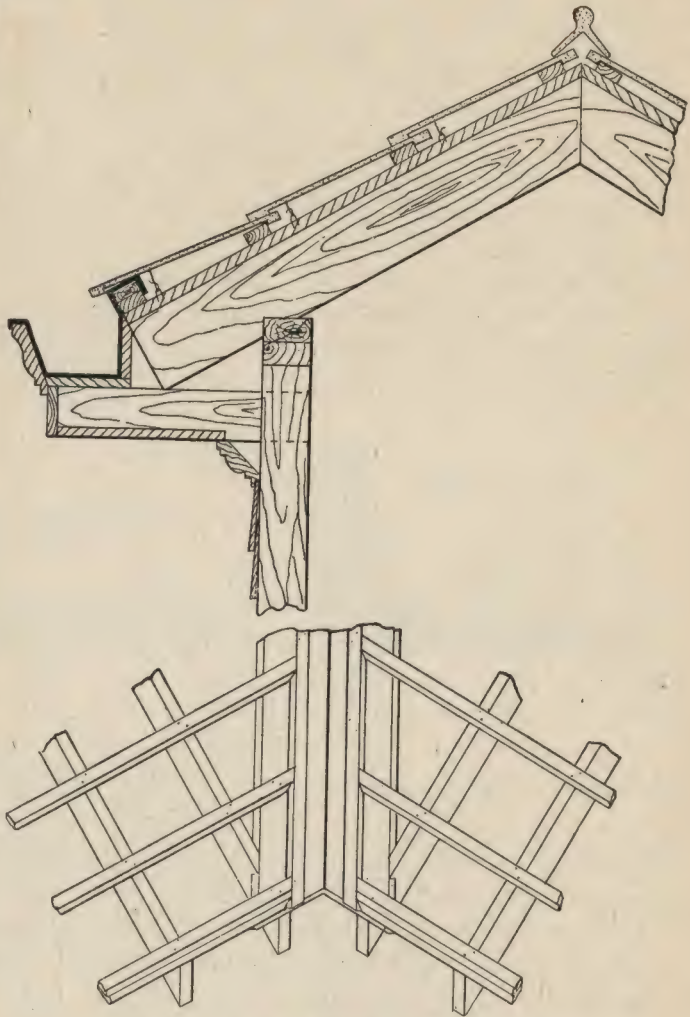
One Method of Laying Roof Tile. Upper detail shows use of sheathing; lower shows valley prepared for open-roof construction.
